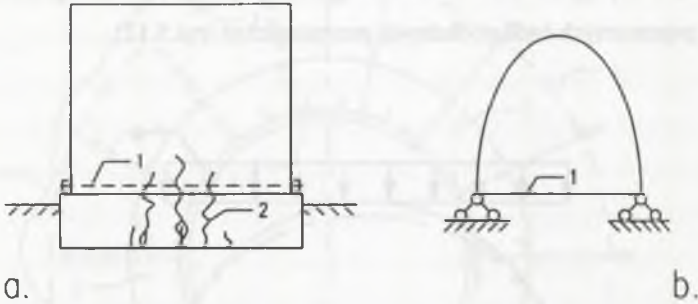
Calculation diagrams: A – of a beam as an undamaged structure, B – of a flat arch as a damaged beam, a – free-supported structure, b – fastened structure, 1 – tension member, 2 – fastening, abutment, h – height of beam
